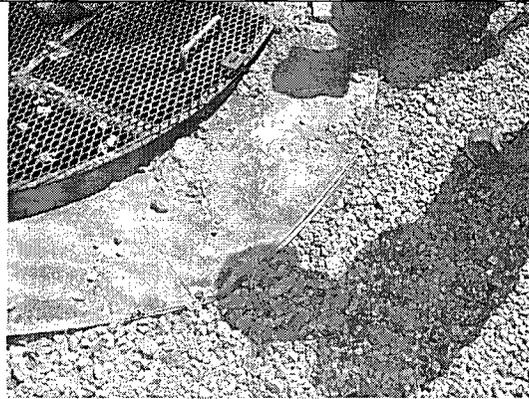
Integrity of second wall on BGT is compromised. Upper lip is not secured to side walls.
